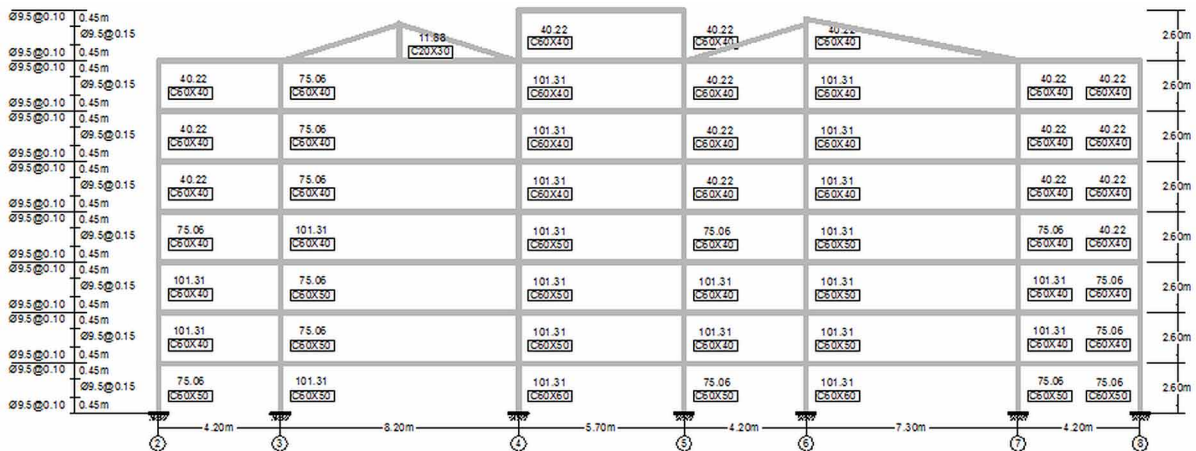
Residential building, geometry and reinforcement in columns of the frame A = frame B
